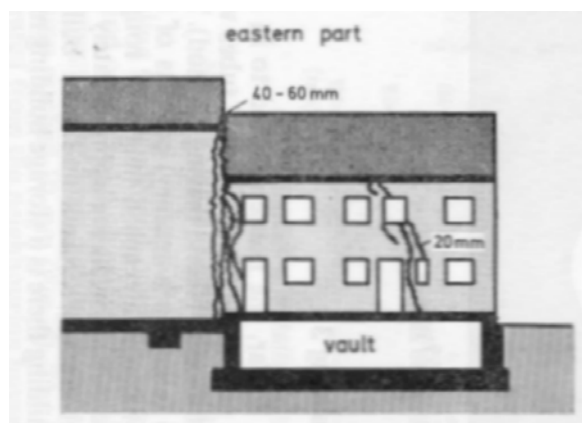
Cracks of masonry building interaction (adapted from Breth and Chambosse, 1975)
